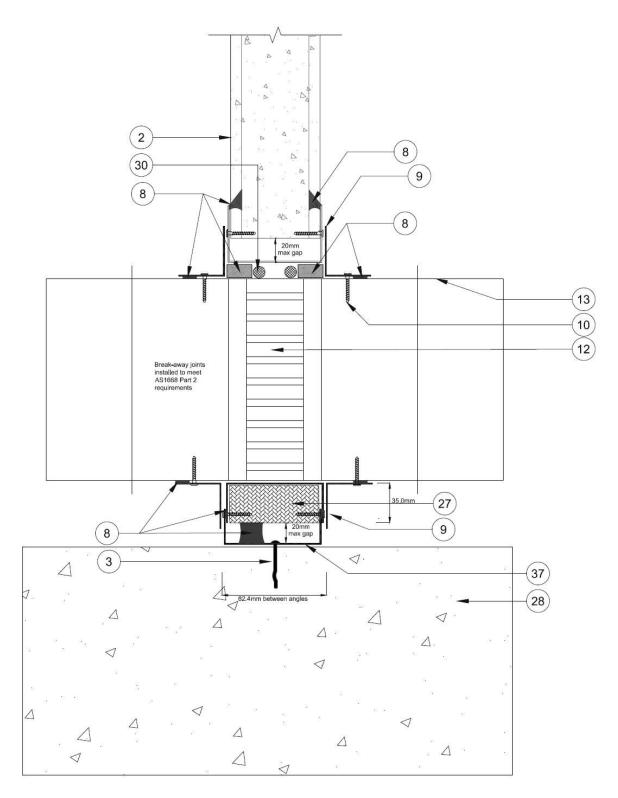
Kilargo Damper installation 35mm-55mm from base of wall
